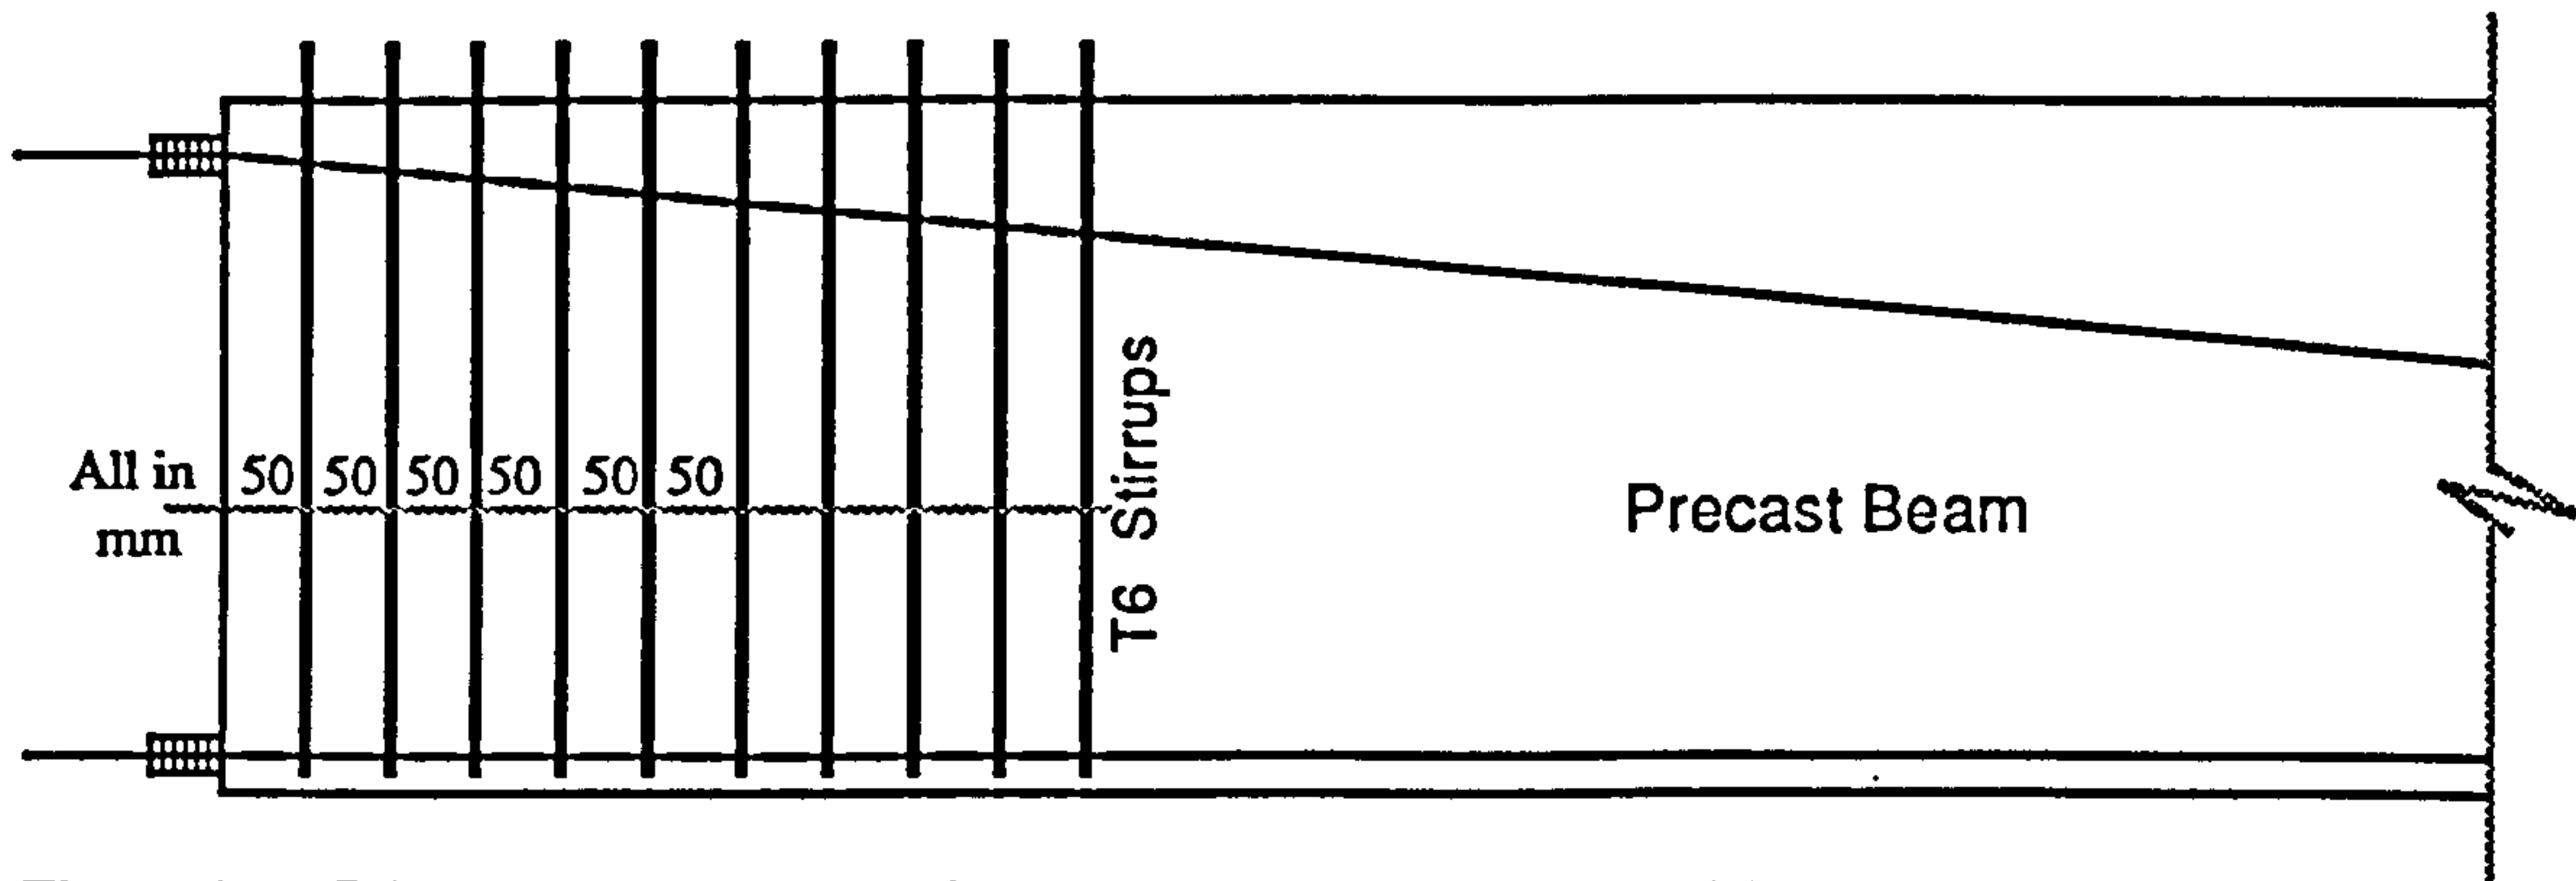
Stirrup Arrangement in the Embedment Part of Precast Beam E30AA2 Sleeving of the Projecting Bars
